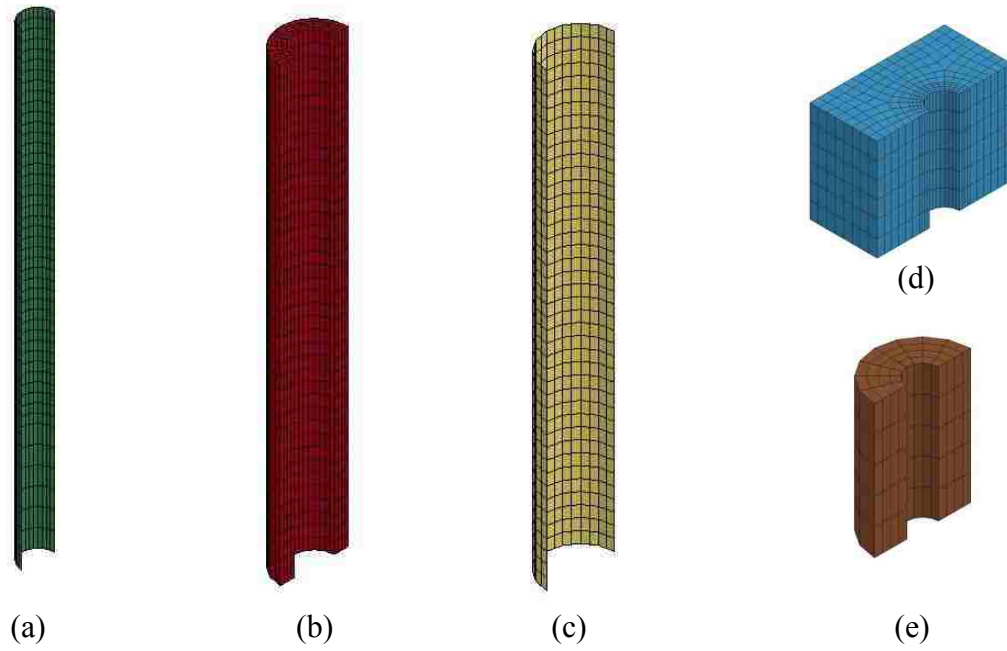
(a) Steel tube, (b) Concrete column, (c) FRP tube, (d) Concrete footing, (e) Loading stub
